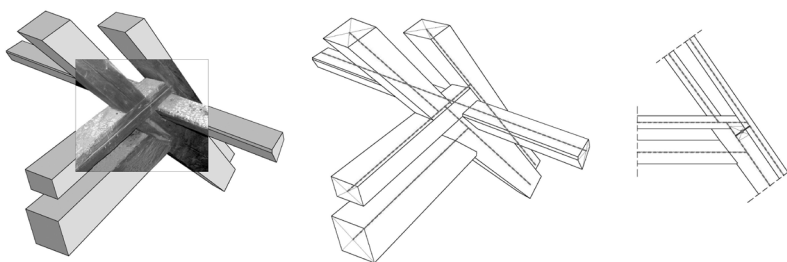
b. Compound rafter – counterbrace – straining beam joint and its modelling
